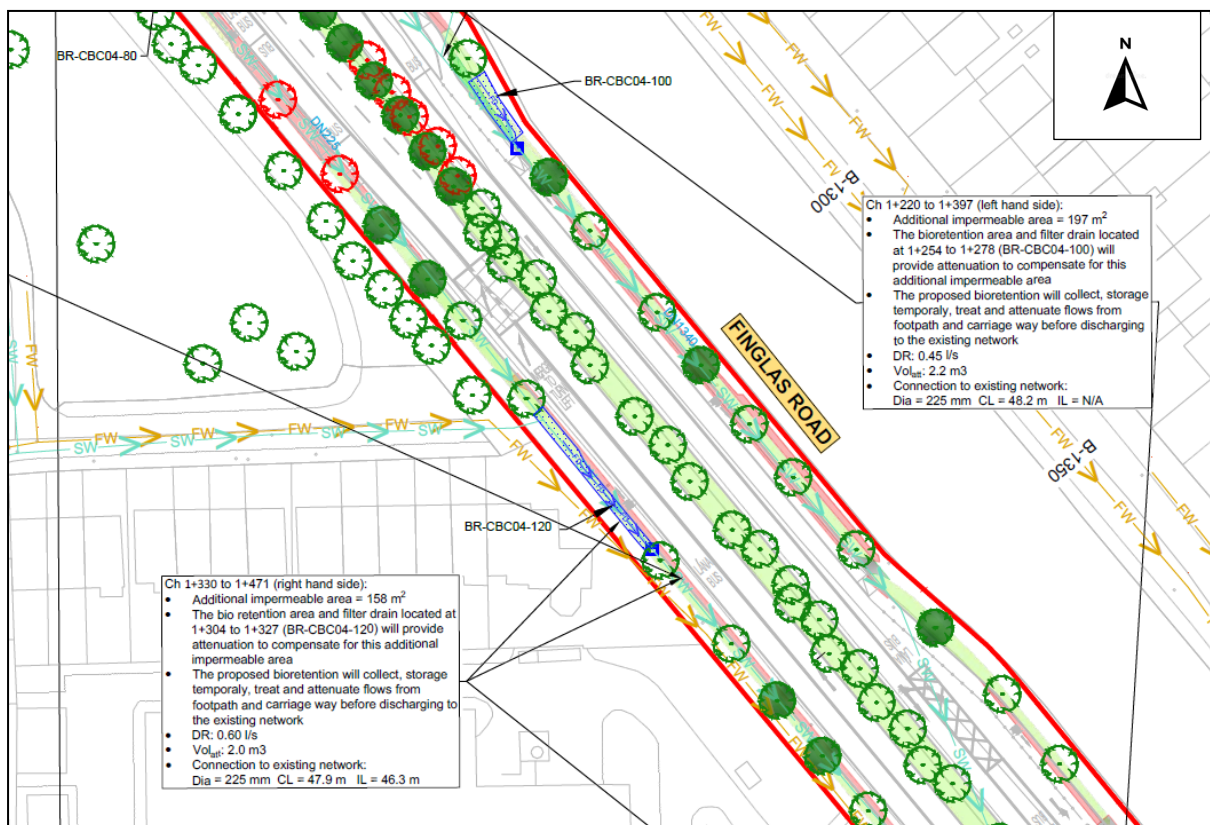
Extract from Surface Water Drainage Drawing Sheet 28 on Finglas Road
